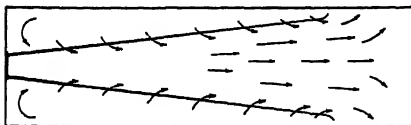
PLAN VIEW LONG THROW SUPPLY OUTLET
